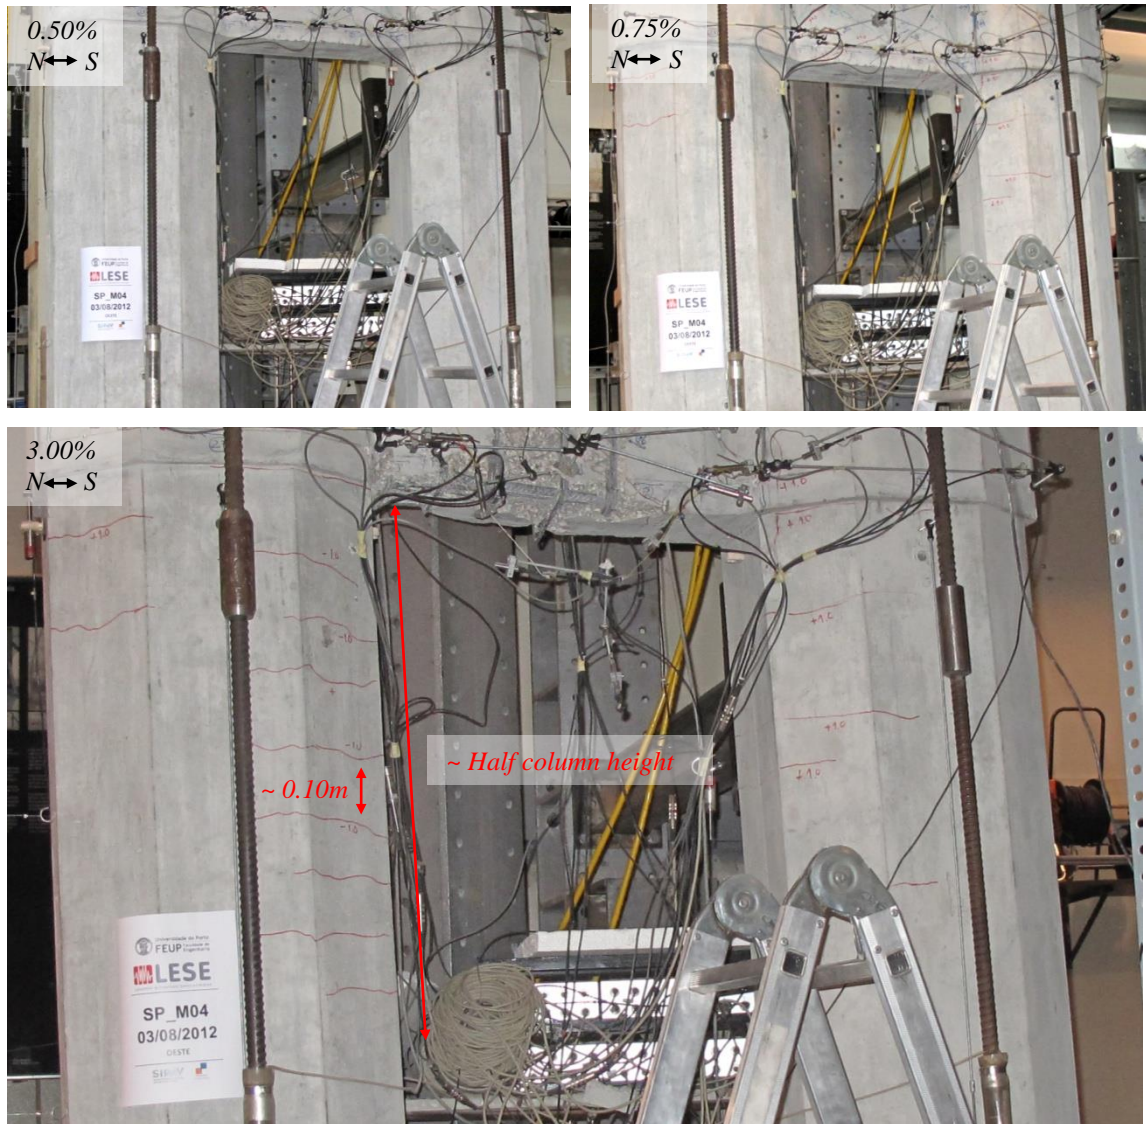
SP_M04 Column cracking patterns
